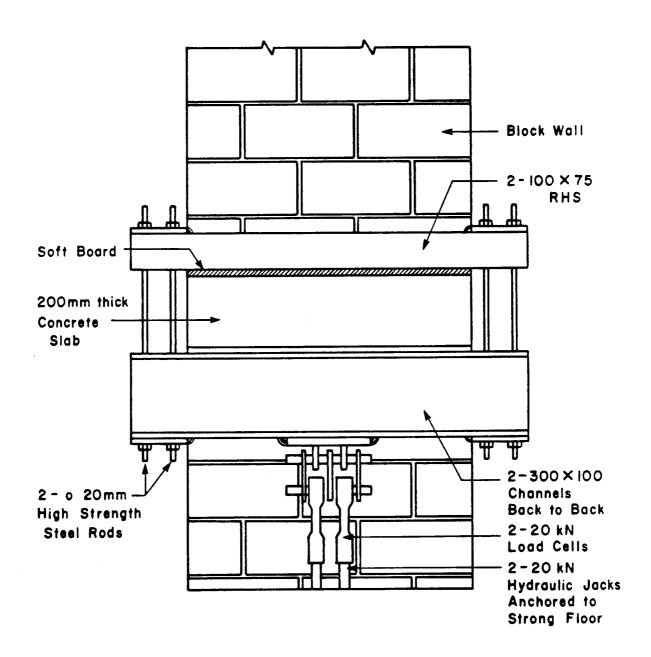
Slab Loading Apparatus for Type I Specimens
